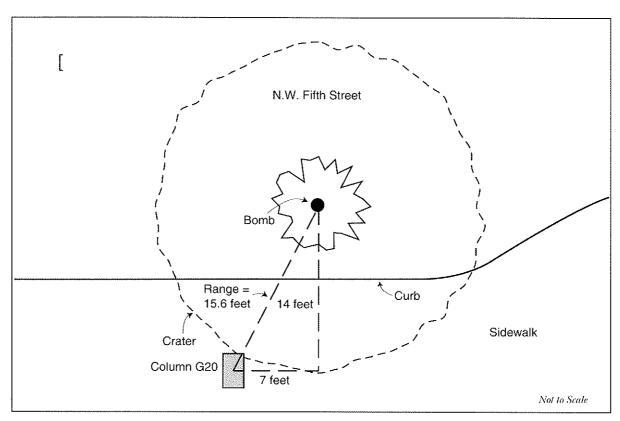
Proximity of Column G20 to location of bomb (plan view).
